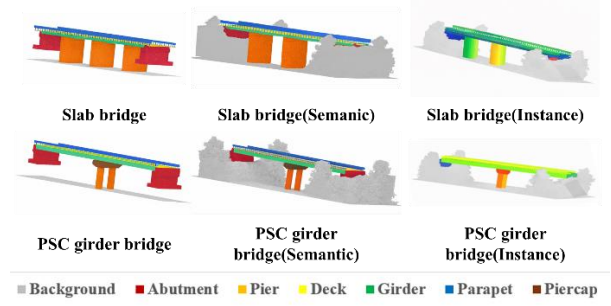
Representative synthetic bridge models used in this study: slab bridges and PSC girder bridges.
